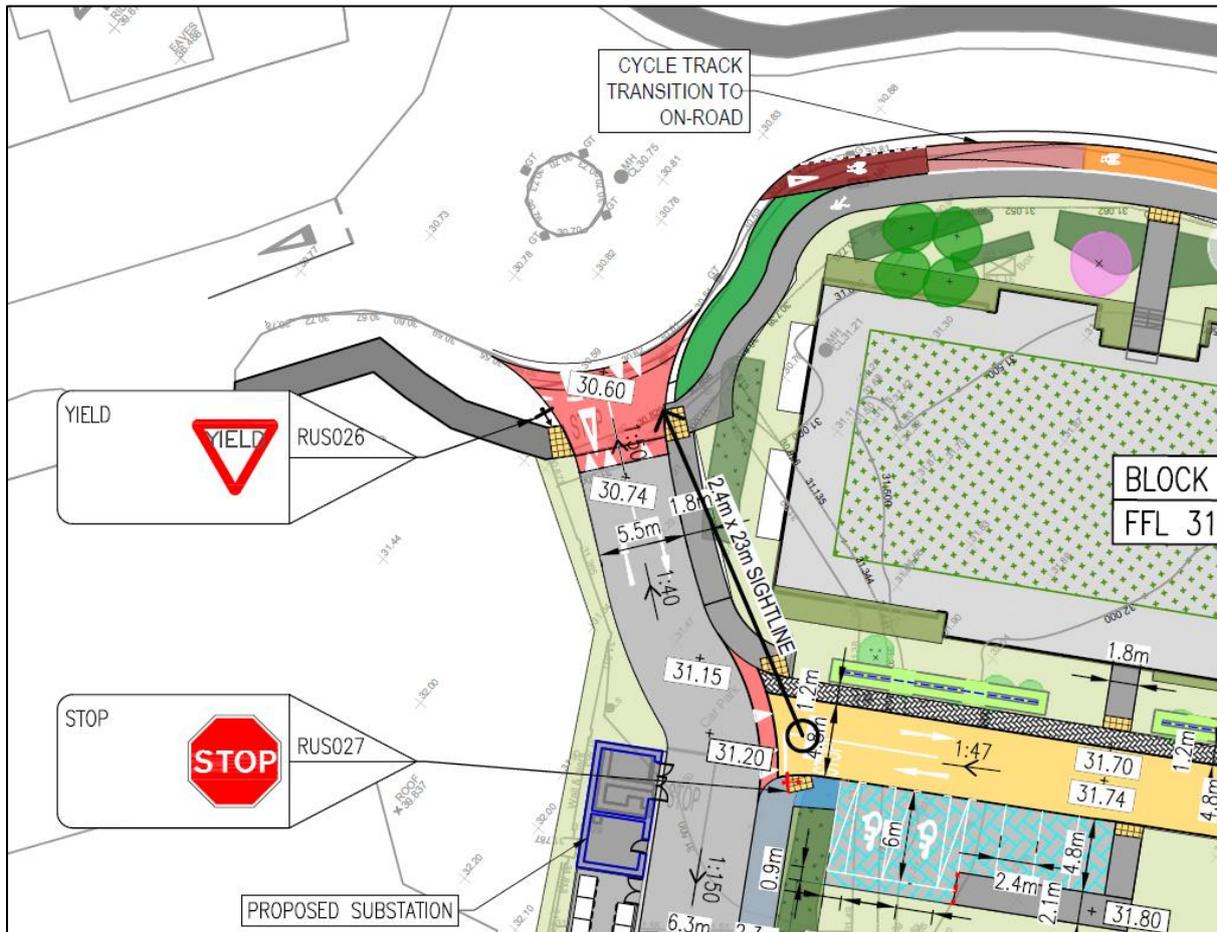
Extract of Road Layout Plan Showing Flat Top Pedestrian Crossing
